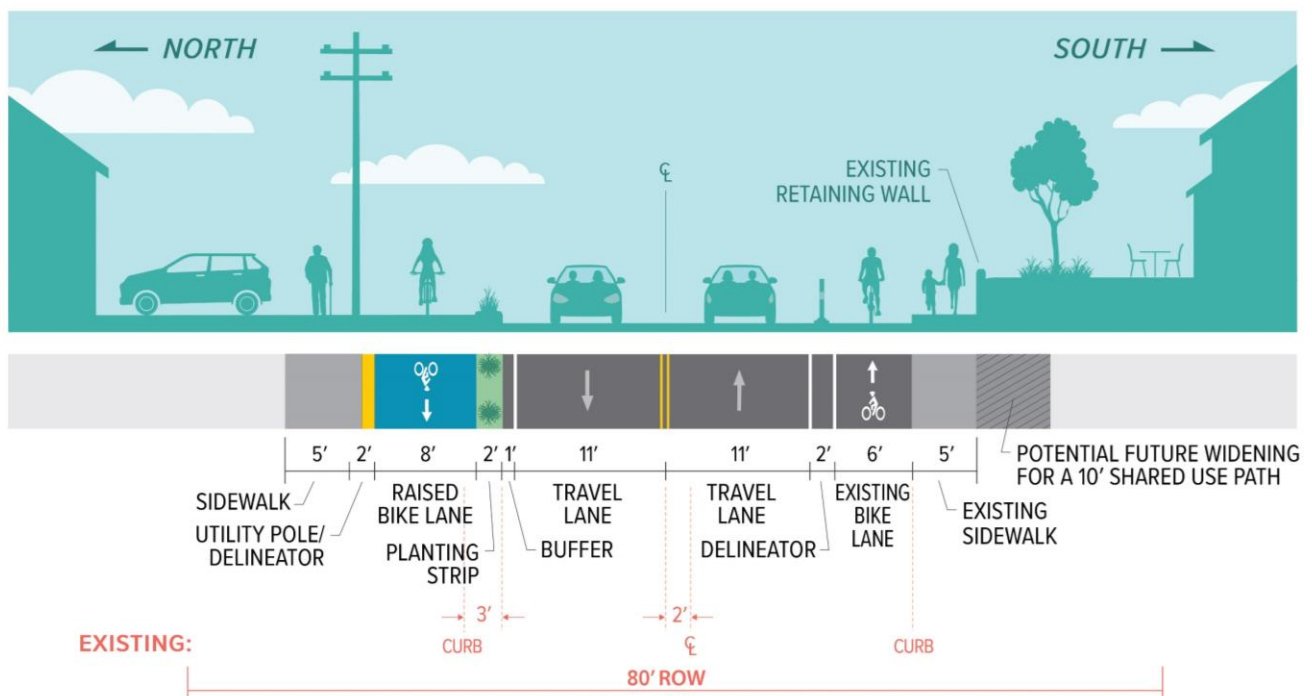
FRANKLIN AVENUE ALTERNATIVE B CROSS SECTION
